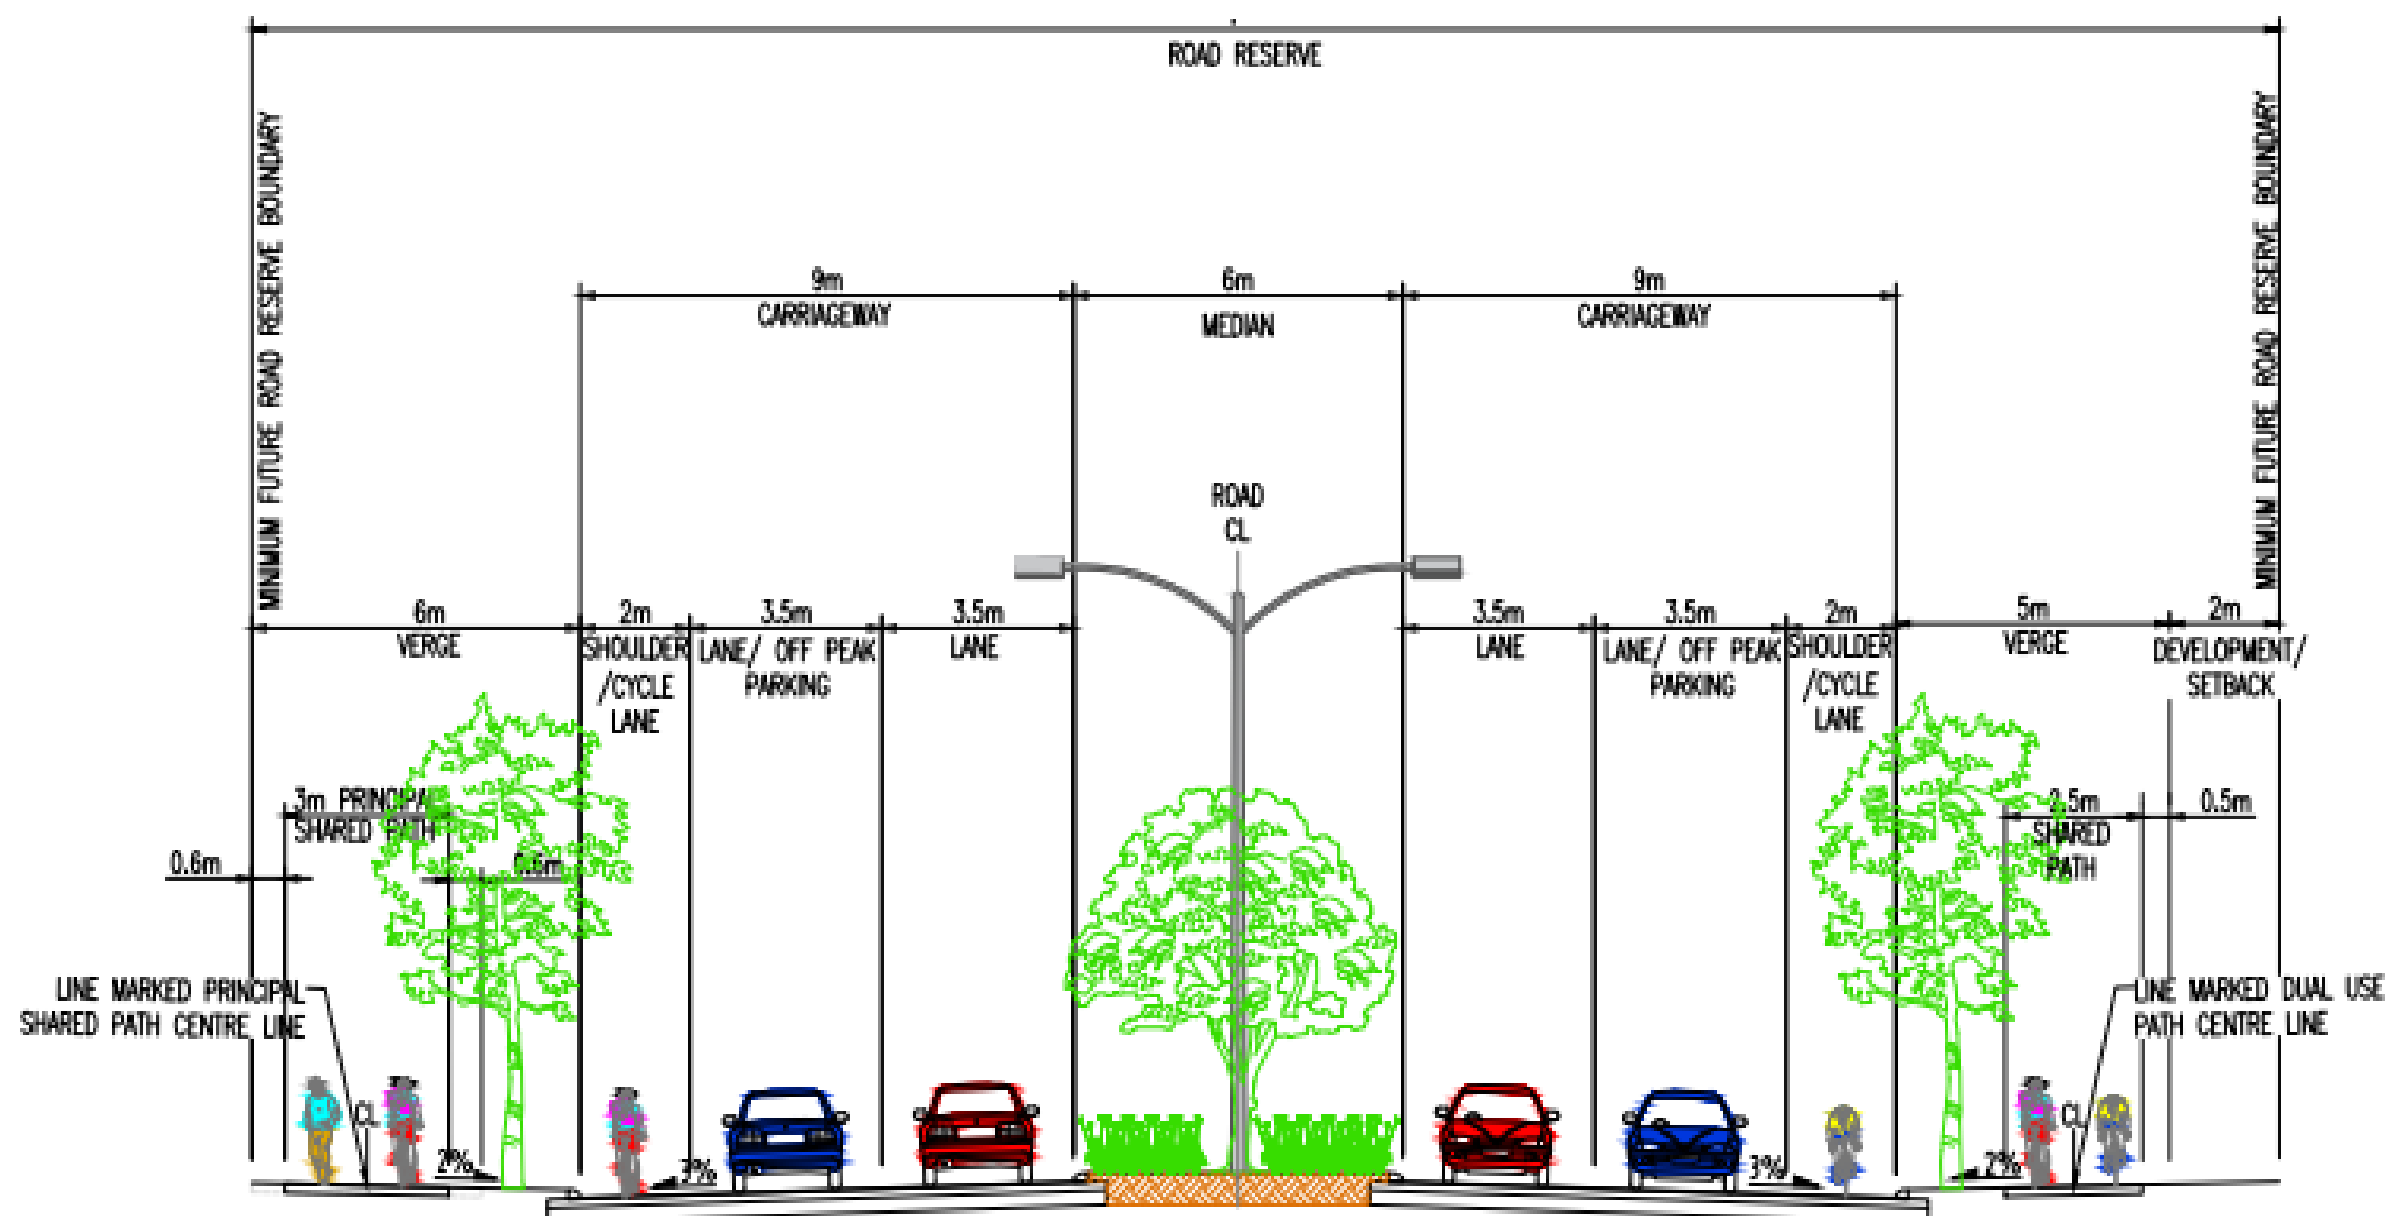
CROSS SECTION ELLIOT ROAD (DISTRICT CENTRE)
